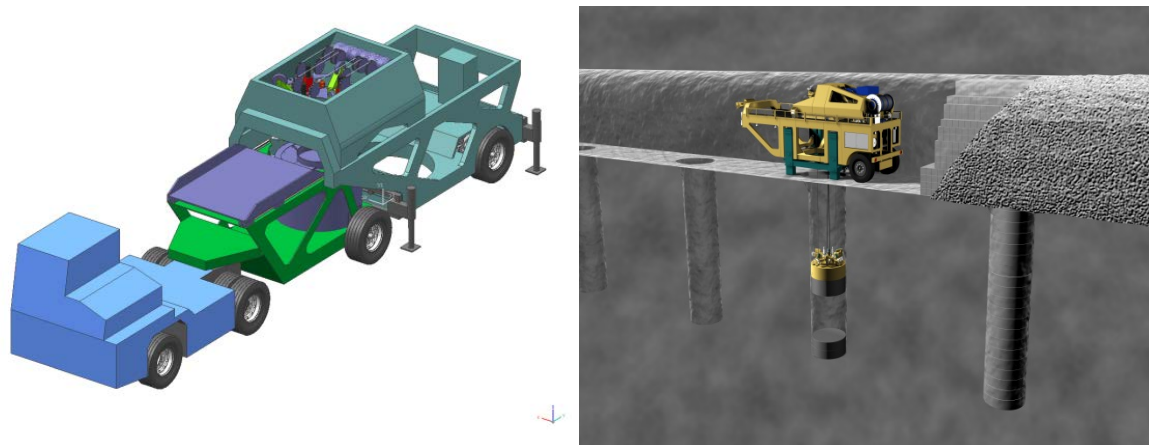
Prototype of the buffer installation machinery and illustration of the installation process. Posiva Oy.
